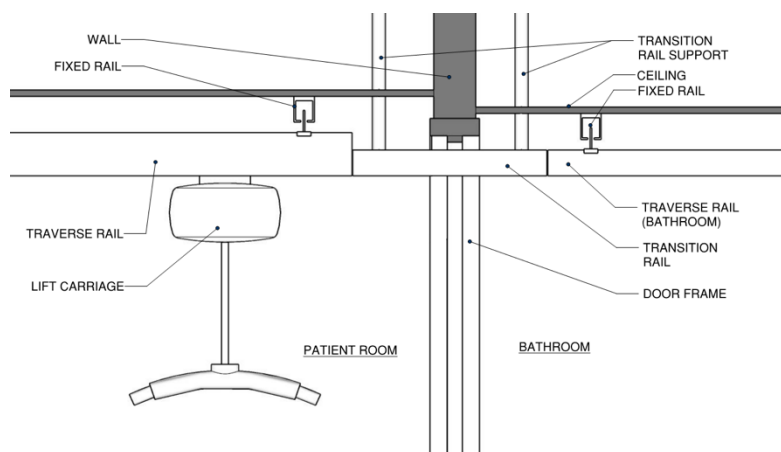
The above illustration represents a section view of upper door opening, showing aligned rails, structural supports for the transition rail, and ceiling planes.
